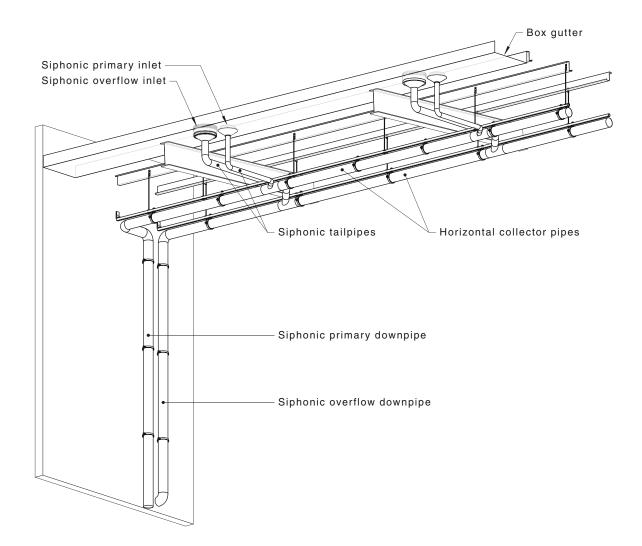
SIPHONIC ROOF DRAINAGE AND OVERFLOW SYSTEM
